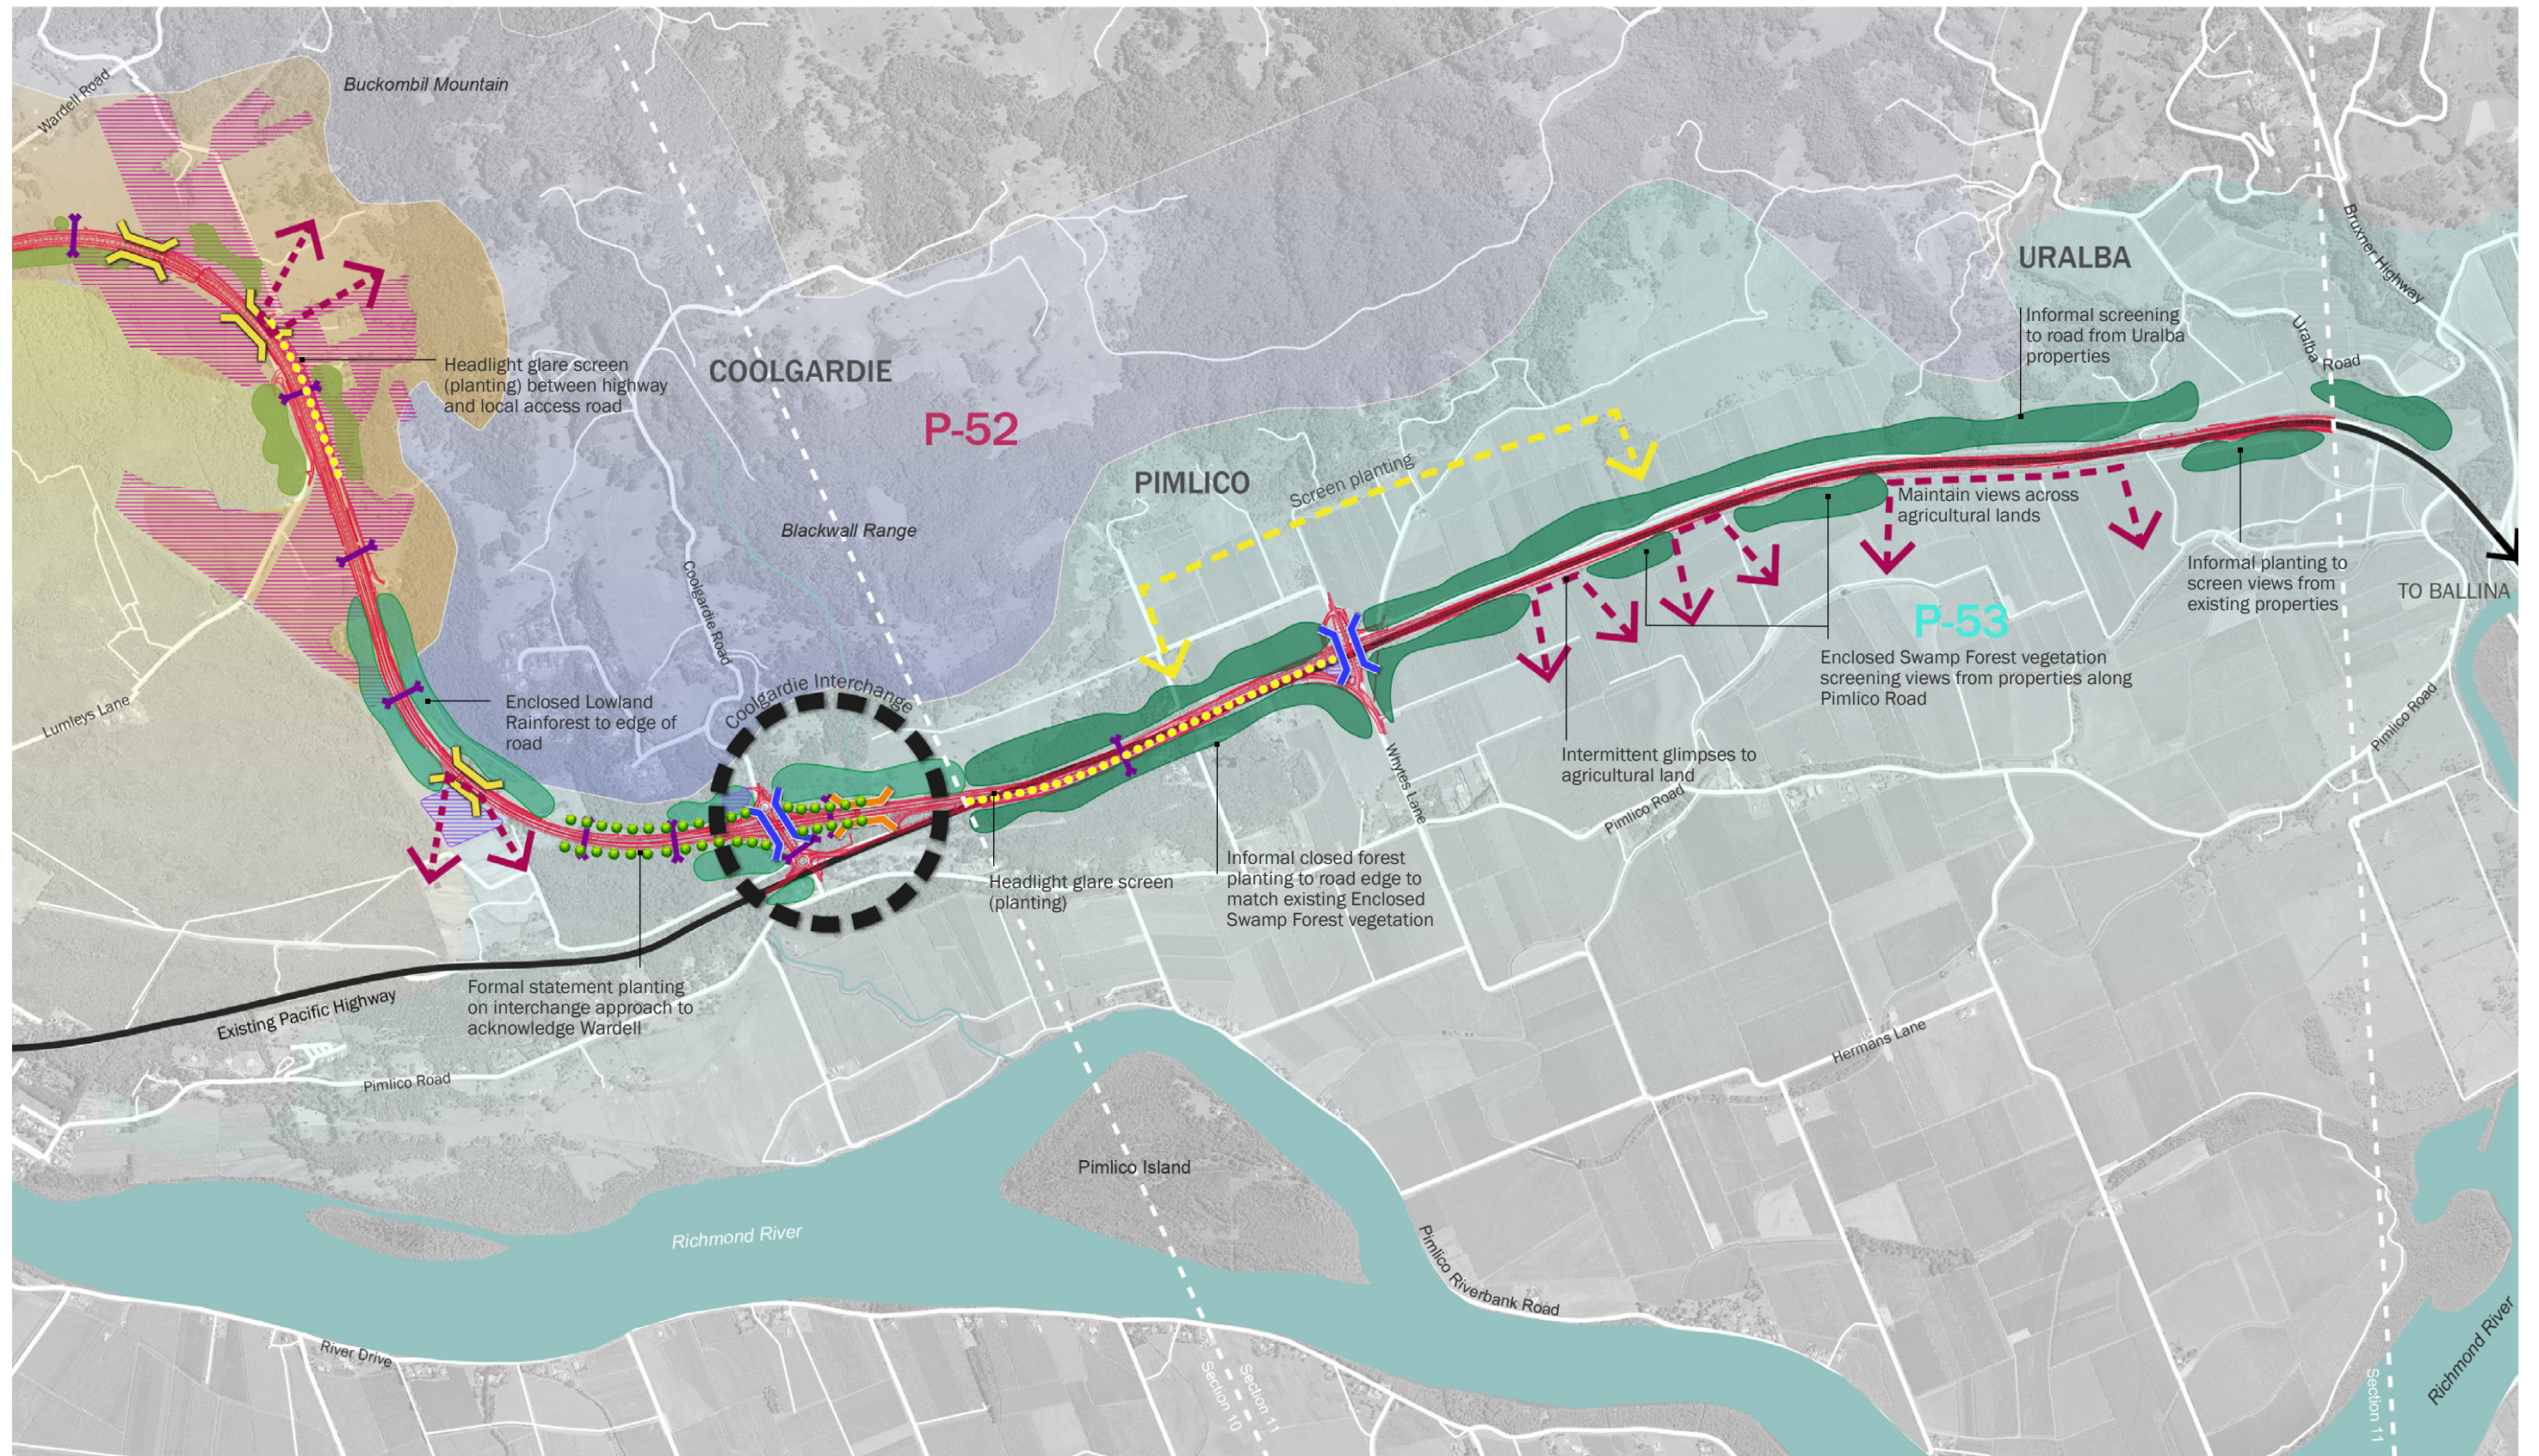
Strategy plan for Richmond River to Ballina (Sections 10 - 11)
